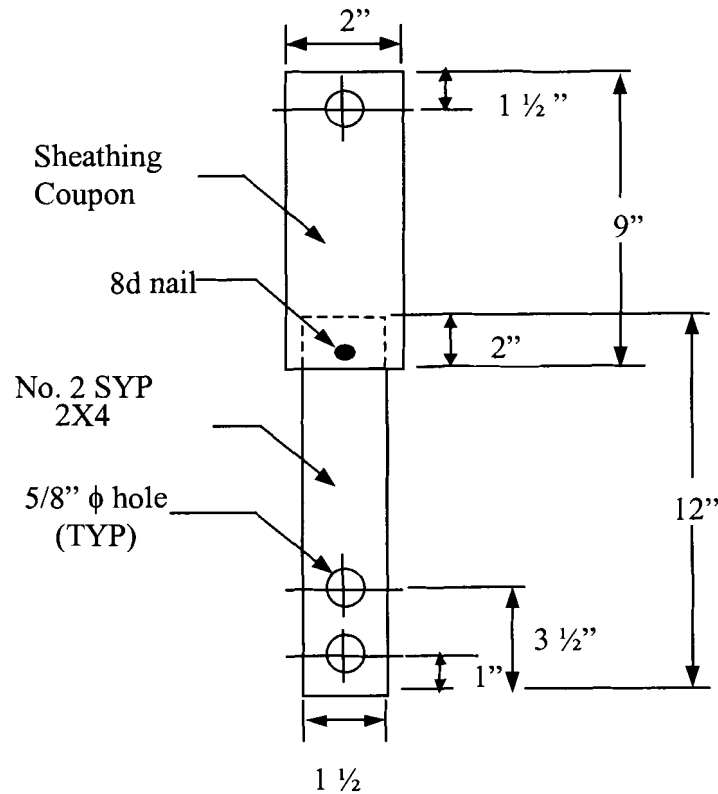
Monotonic Connection Test Specimen Dimensions.
